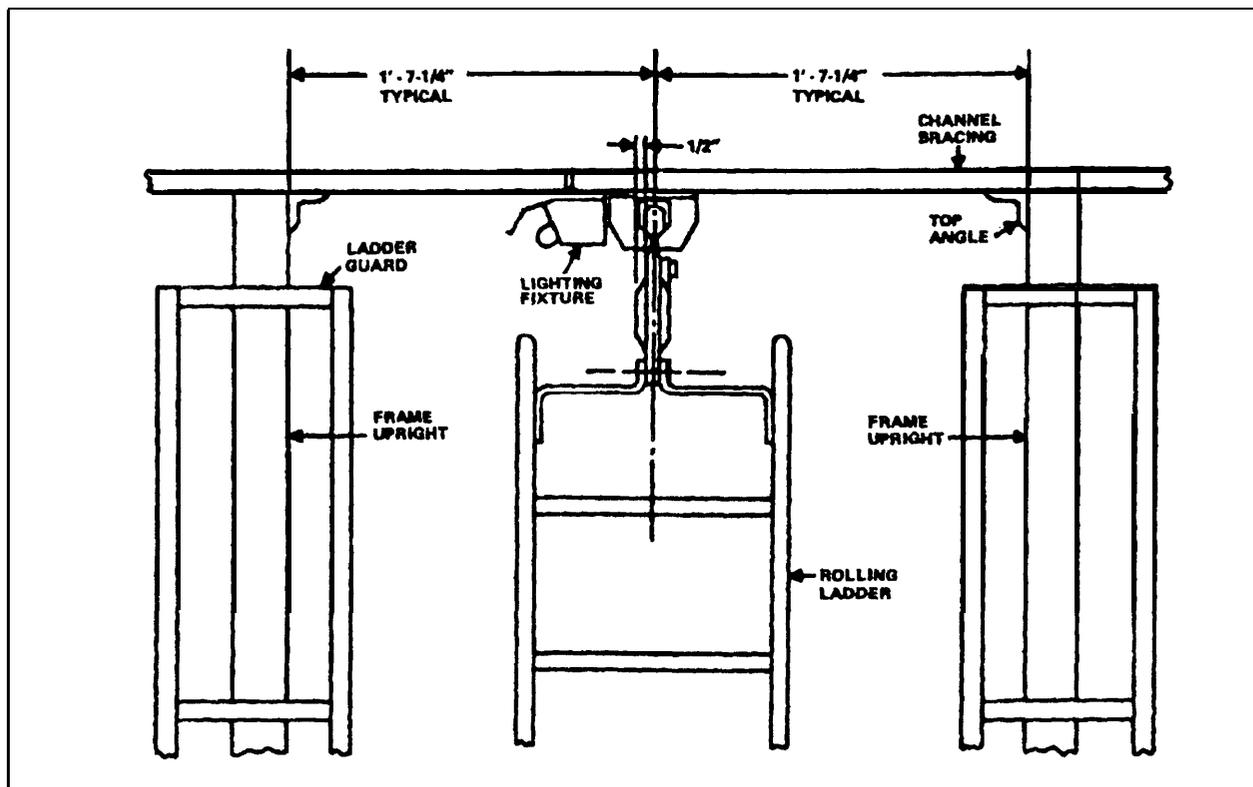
Typical Placement of Lighting Between Equipment Frame (With Ladders)
